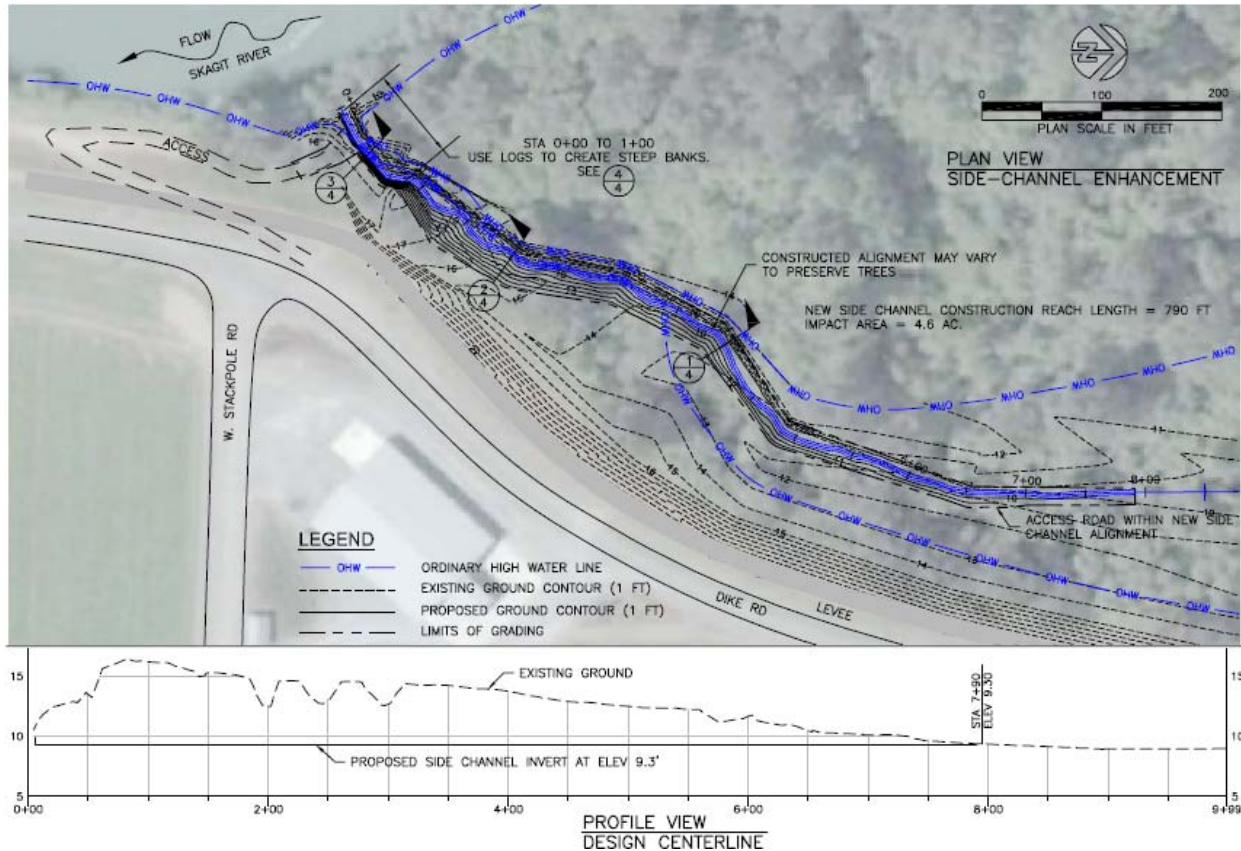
Plan and Profile of the proposed backwater channel for the TNC site. Vert Datum assumed to be NAVD88. (Inter-fluve, 2009)
